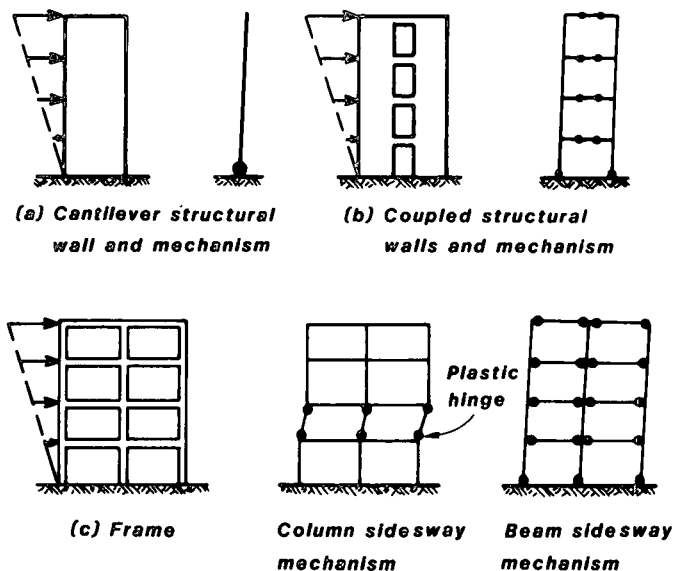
Building Structures With Horizontal Seismic Loading and Possible Mechanisms.
